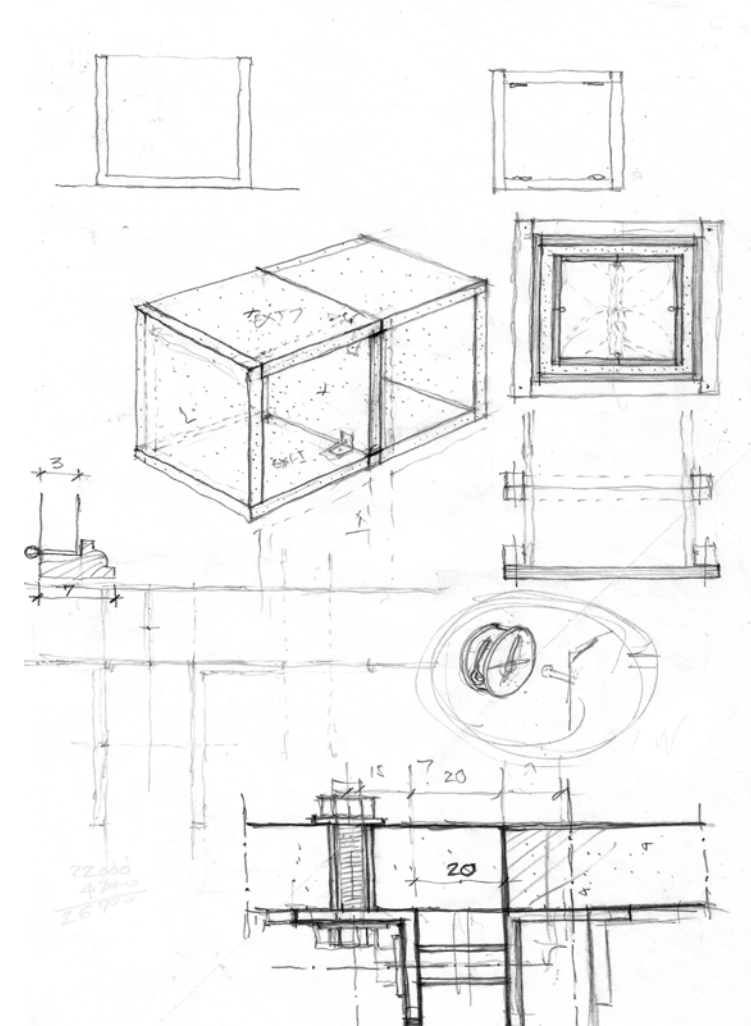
Drawings, moulding and mounting of ACCSARQB13, 2017.
